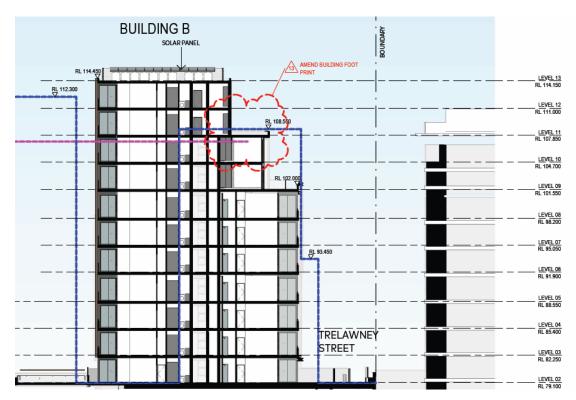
Section - Interface Between RFB on No. 7 Rutledge Street and Proposed Building B
